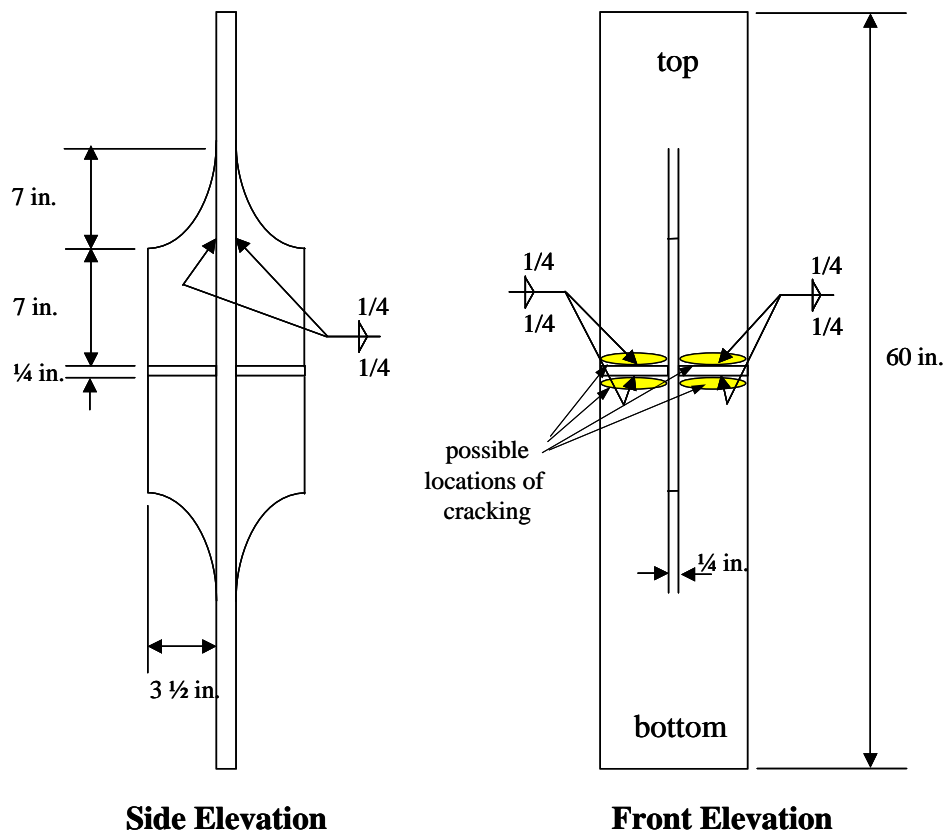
Welded Steel Specimen Tested by Spadea (2002)
